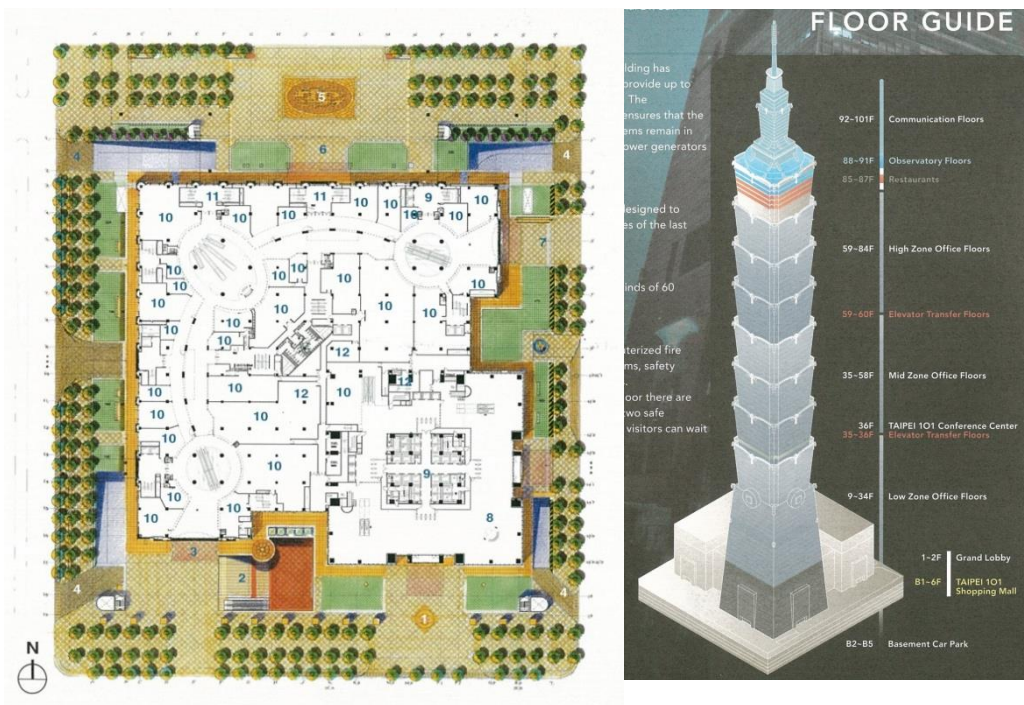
Left: The ground floor plan. The lower-right area is the office tower and the rest belongs to the shopping mall. The building area is 15,138m<sup>2</sup> in total (source: *Architect* 2003:87). Right: The building height is 508m. The building is separated into three parts of office floor by two elevator shafts marked in red. The top area includes a restaurant, an observatory and a communication floor from 85-101F (source: a brochure of Taipei 101 building, *Architect* 2003, 2004).
